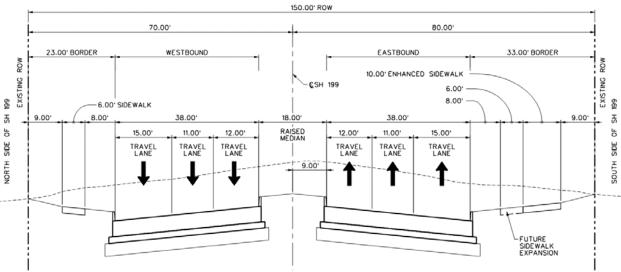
Section 1 – IH 820 to Ohio Garden Road Typical Section
